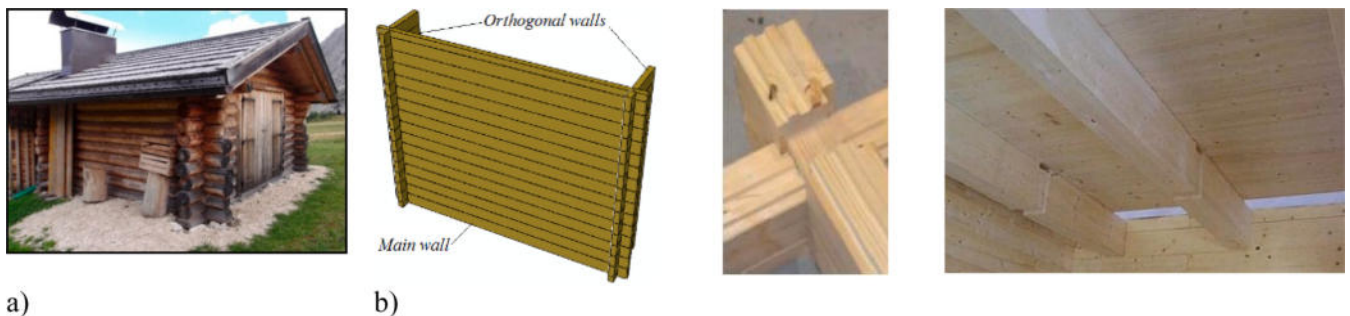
Blockhaus example: a) traditional rural constructions; b) typical shear-wall, detail of connection between orthogonal walls and floor [30].
